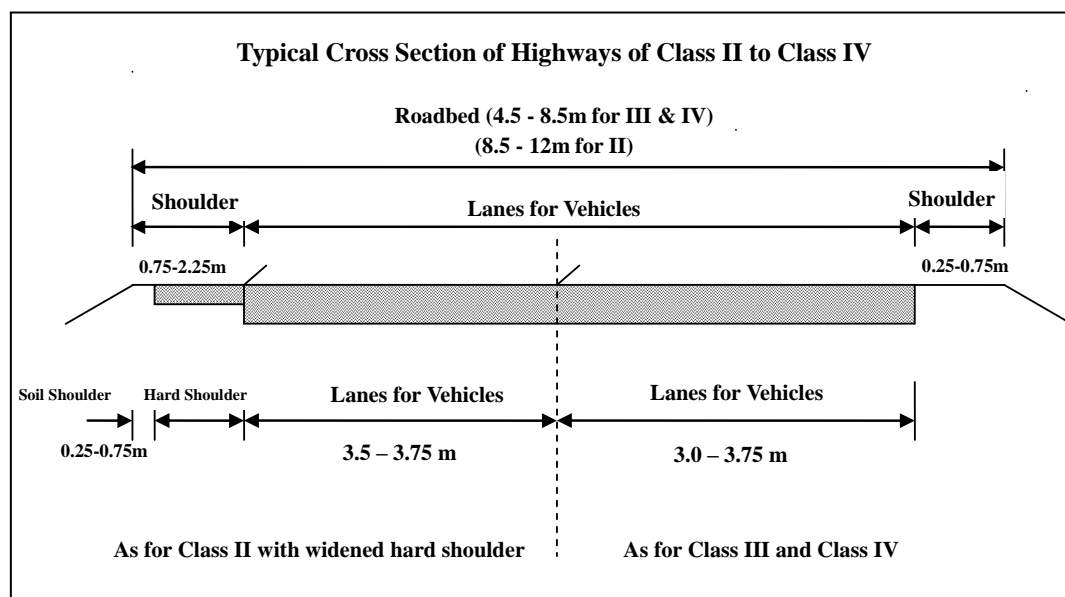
Typical PRC Class II-IV road cross sections and right of way (≥ 1 m safety zone on each side not shown)
